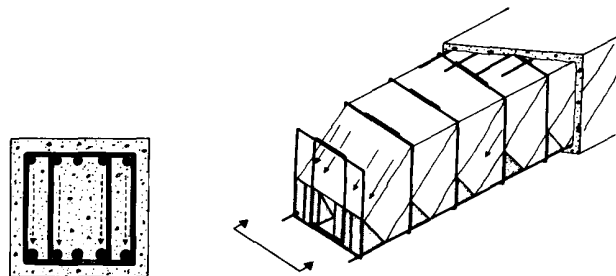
Diagonal struts in beam with distributed stirrup legs
